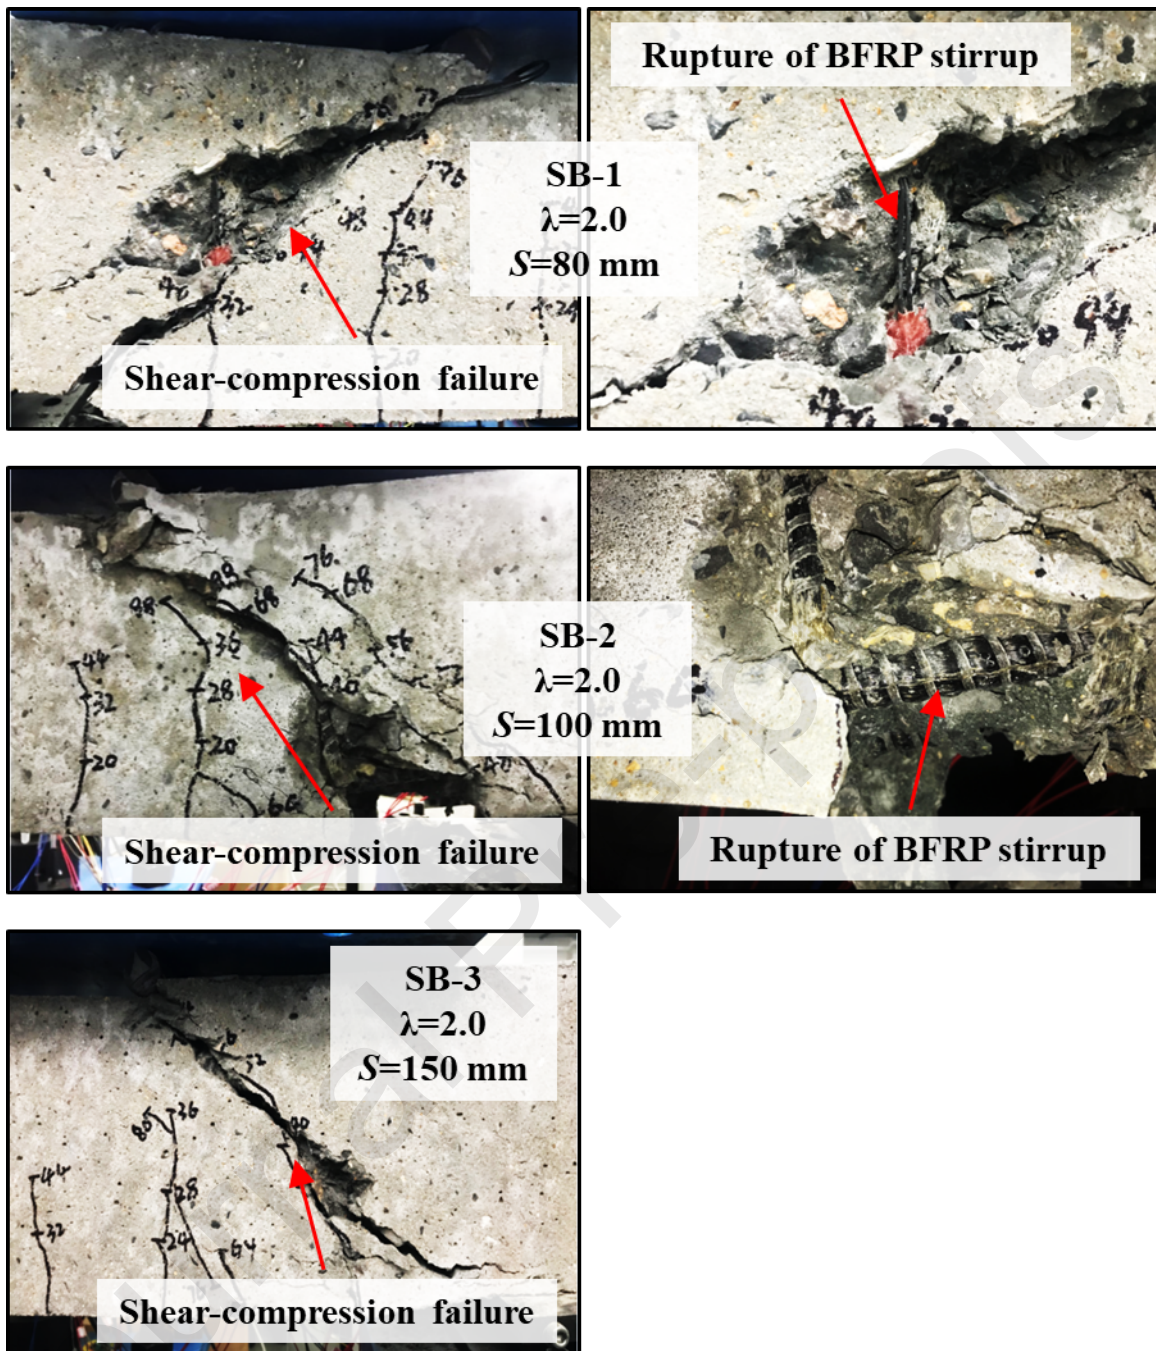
Failure modes of BFRP reinforced IPC beams ($\lambda=2.0$) with different stirrup spacings ($S = 80, 100, 150$ mm).
